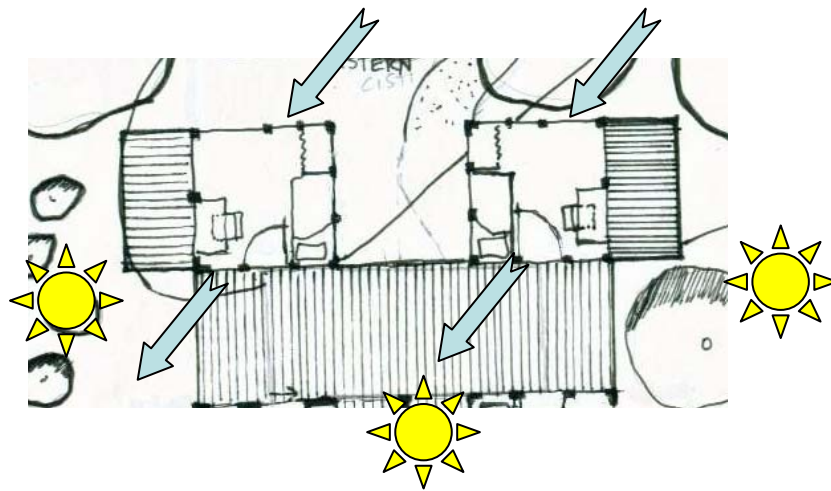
"Eyes on the Forest" room layout, sun path and trade winds
